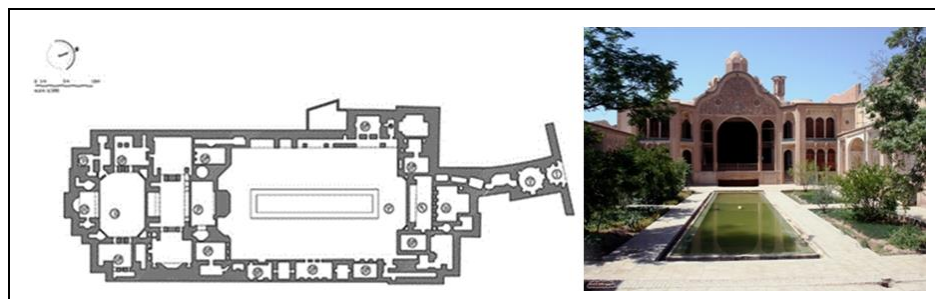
Plan (left) and picture (right) of courtyard house, Kashan, Iran.
